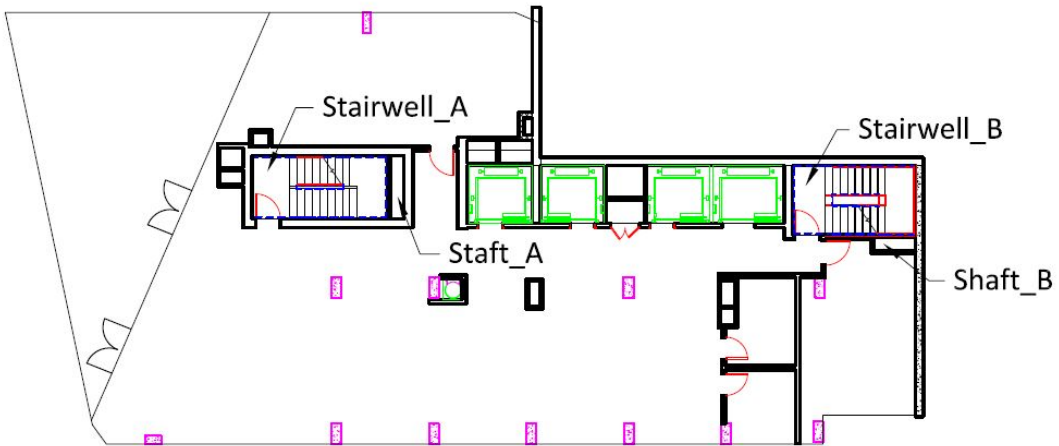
28th floor has an open floor layout for restaurant and bar usage.
